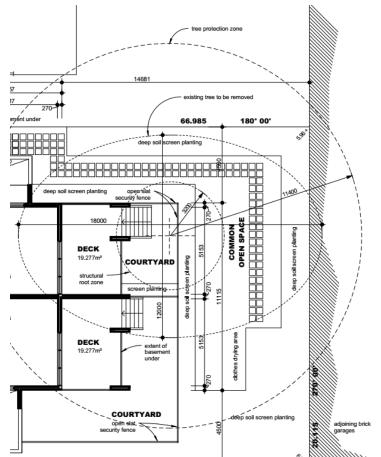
Ground Floor Plan showing (from centre) the structural root zone, canopy spread, and tree protection zone, of the existing Jacaranda mimosifolia (MacGillivray Architects, 2017)
